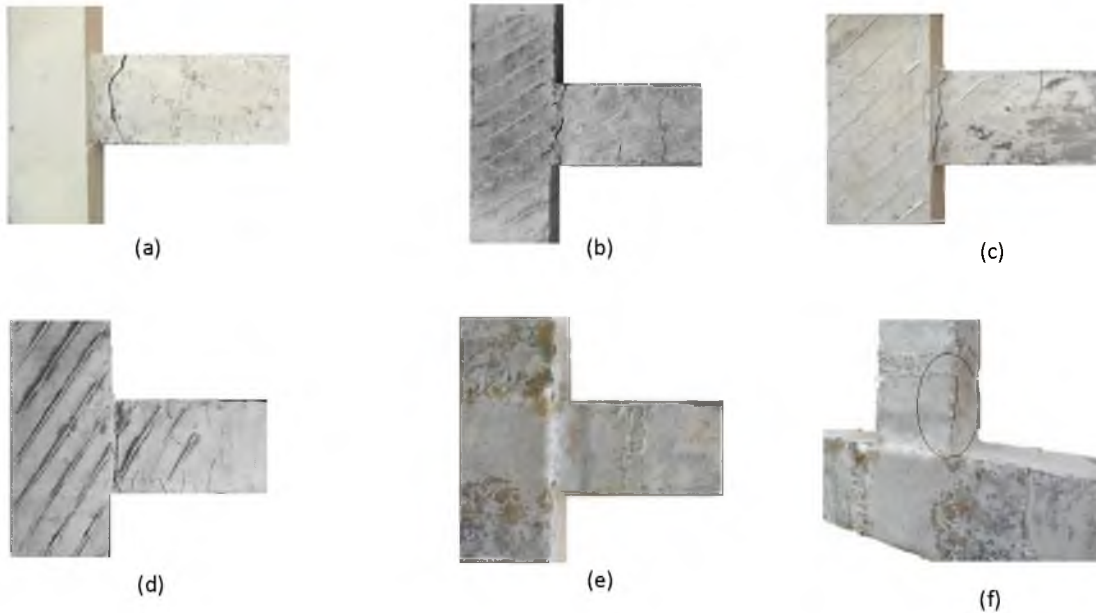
Crack pattern of (a) BCJC specimen, (b) BCJN30 specimen, (c) BCJN45 specimen, (d) BCJN60 specimen, (e) BCJEB specimen, (f) Delamination of BCJEB specimen
